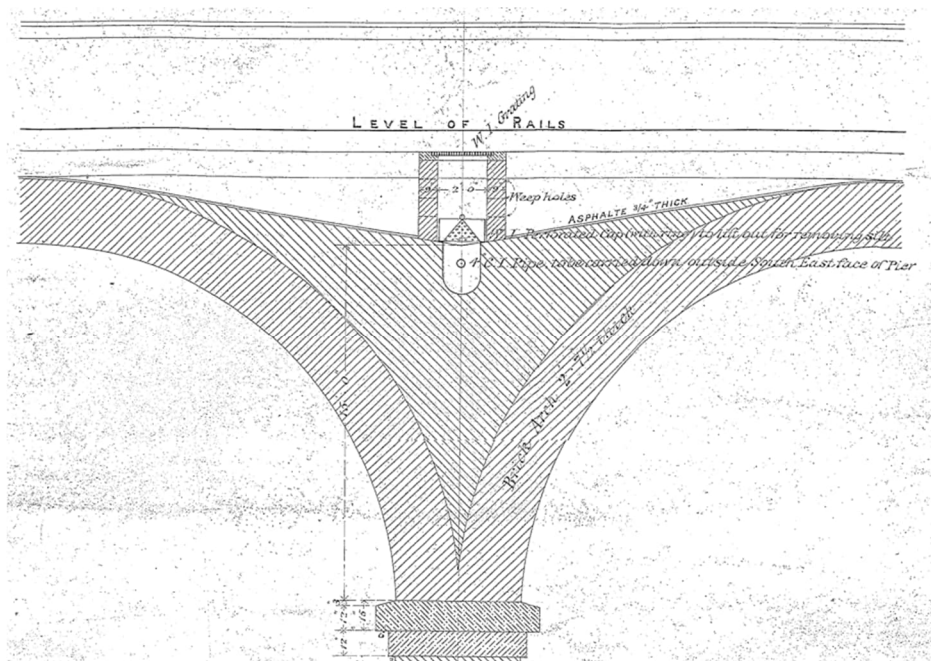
Excerpt of archive drawing stating pipe to be carried down south east face of pier.
